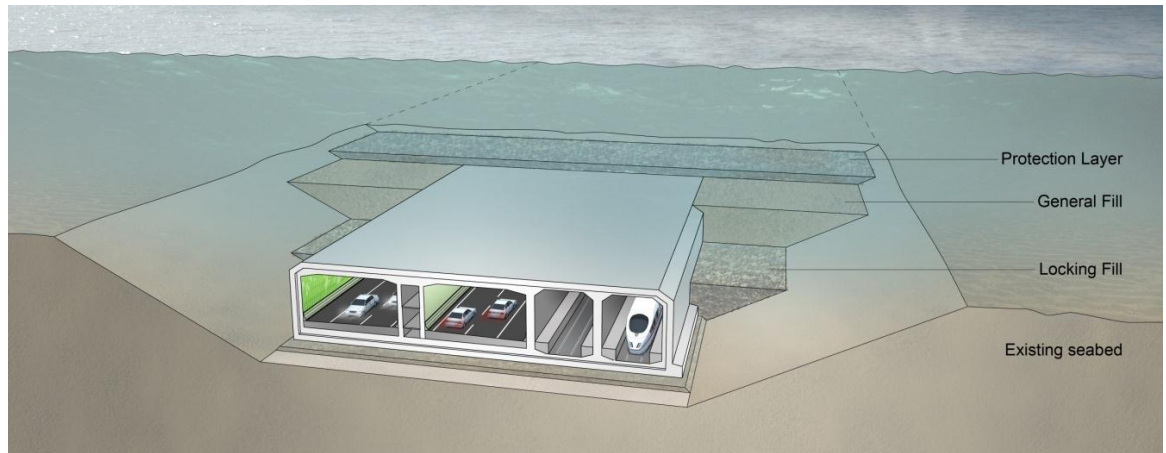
Cross section of dredged trench with tunnel element and backfilling.
